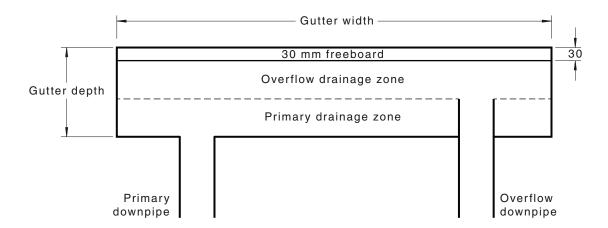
GUIDE ON TYPICAL BOX GUTTER DRAINAGE ZONES
